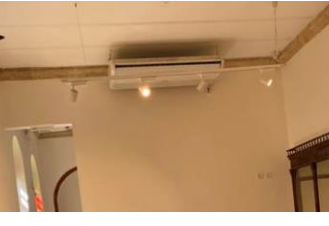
Existing First floor (Hebron Reconstruction Committee,2021)
